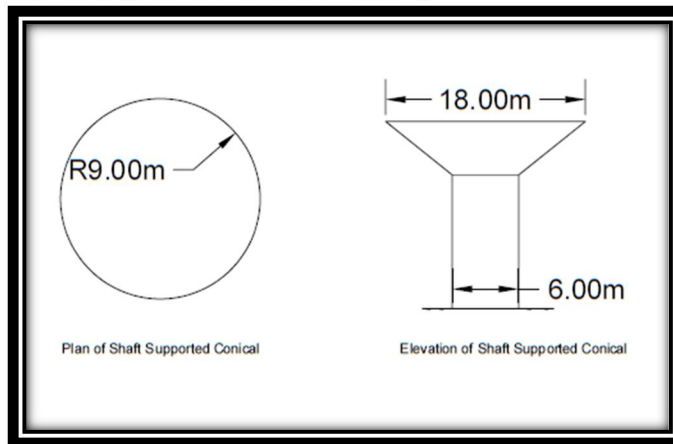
Plan and Elevation on Shaft Supported Conical Shape of Water Tank
